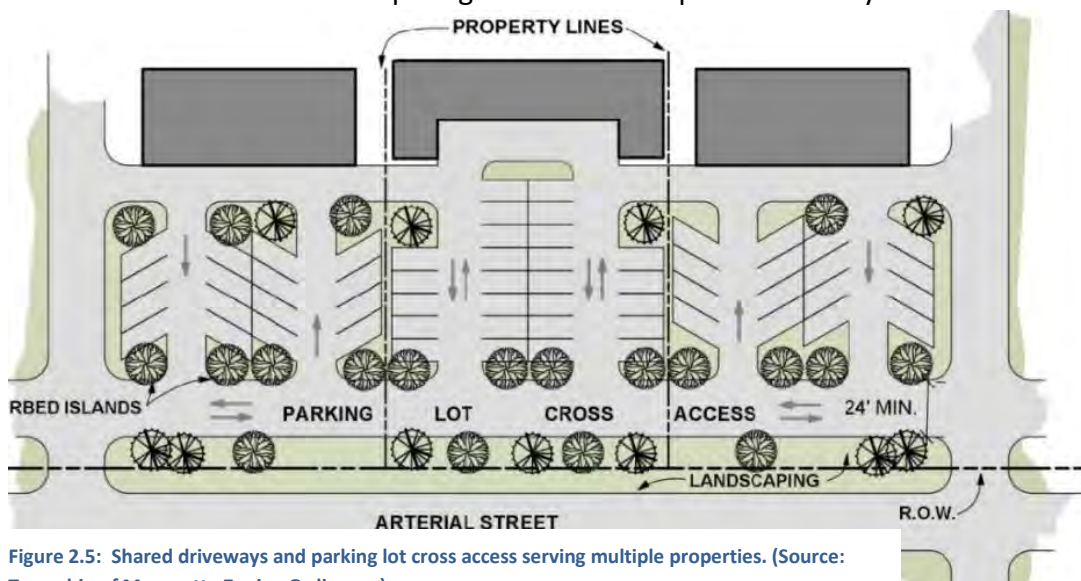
Shared driveways and parking lot cross access serving multiple properties. (Source: Township of Marquette Zoning Ordinance)
